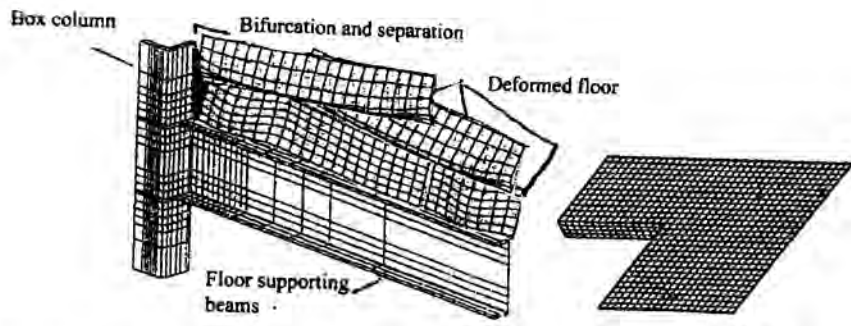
(a) Floor on floor supporting beams with Box columns
